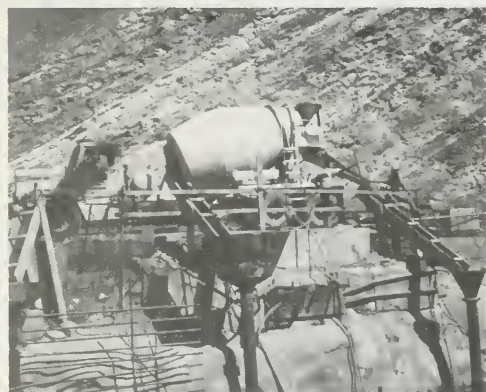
Placing Concrete in 10-Inch Drop Tubes
